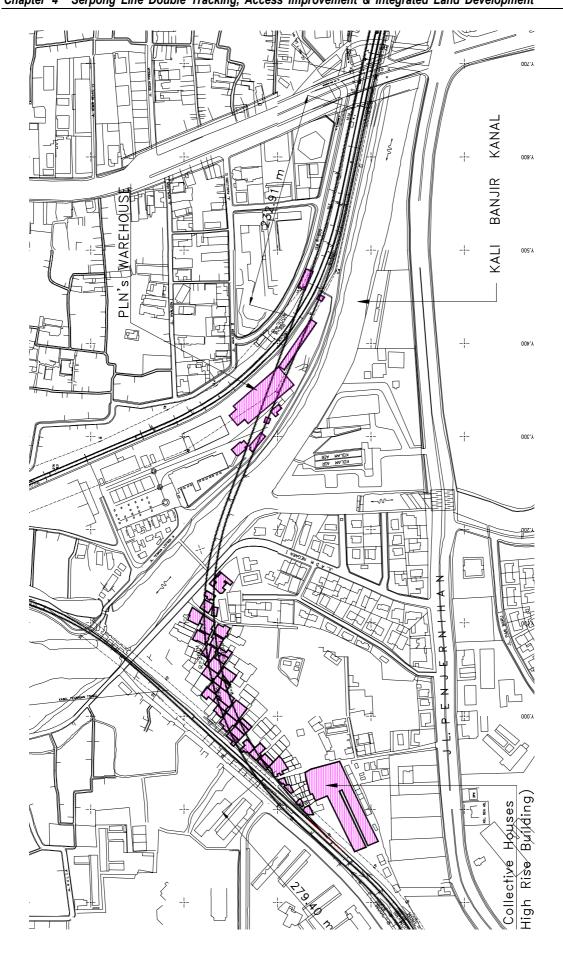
Alternative-1 (Elevated Track) of Shortcut Plan
